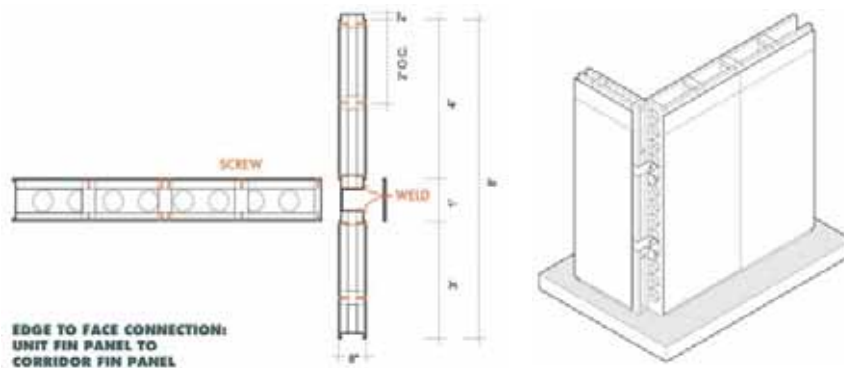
Edge to face *Fin Wall Panel* connection: Unit *Fin Wall Panel* to Corridor *Fin Wall Panel*. Source: (Author 2013)
